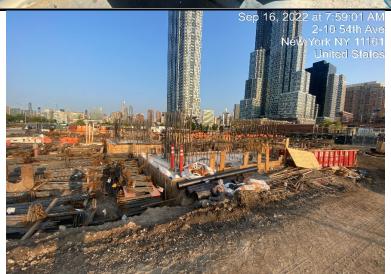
Excavation of soil in Grid WC-05 for foundation elements, view facing northwest.
